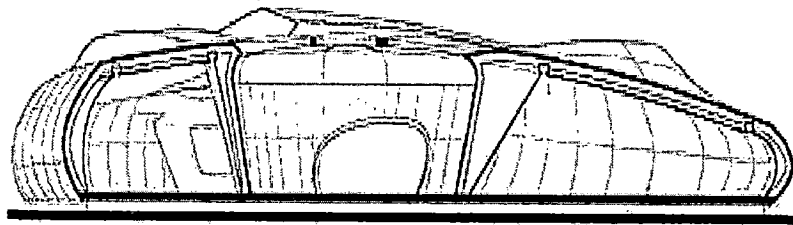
Sketch showing Roof and Cladding Joint Detail (HUNTER, Will, 2008)
